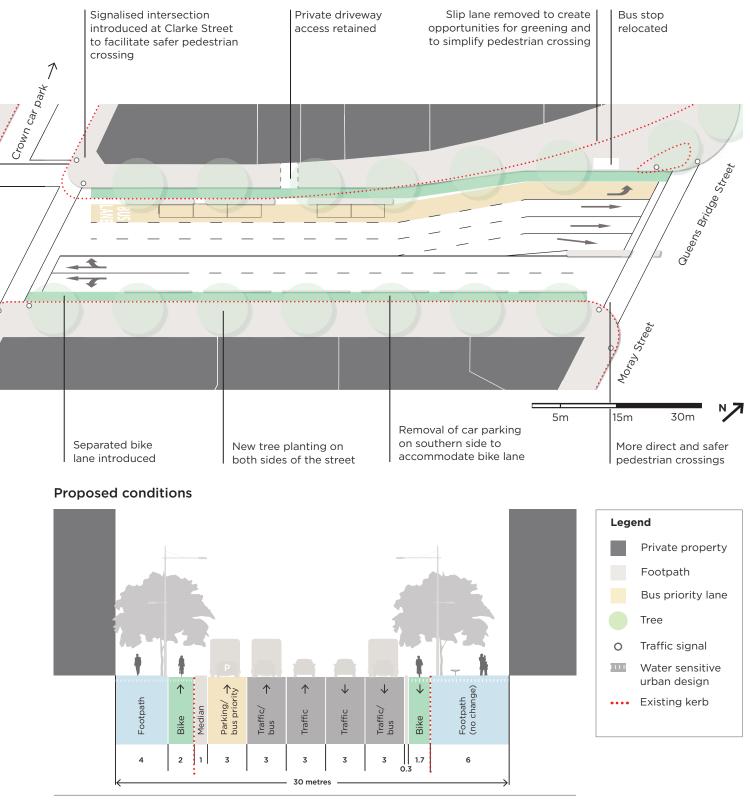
Proposed conditions of City Road looking east towards Queens Bridge Street (Section A)
